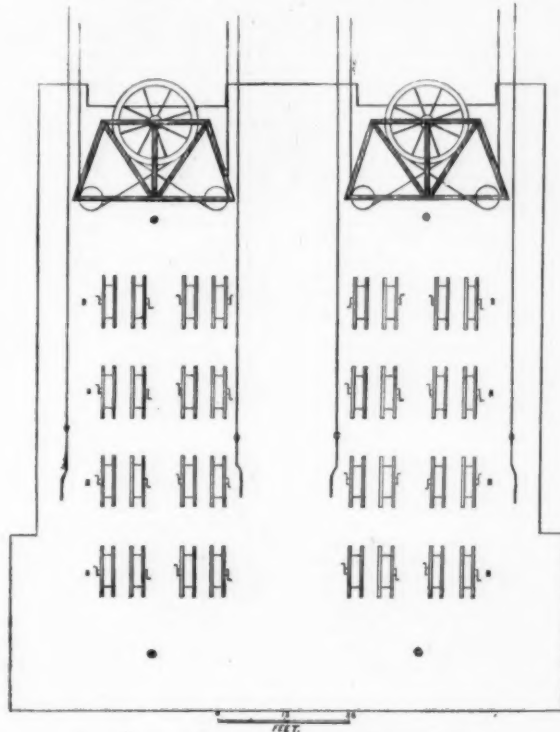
PLAN OF TOP OF ANCHORAGE.
